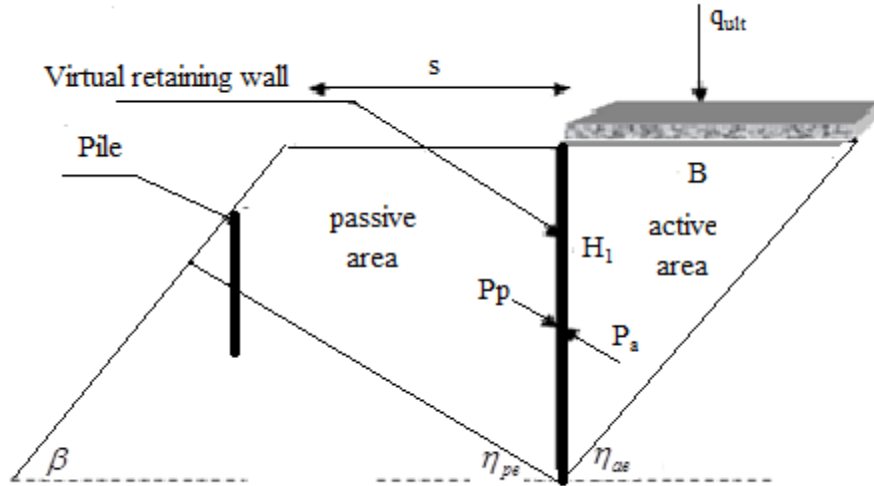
Failure mechanism of soil beneath footing (virtual retaining wall method)
